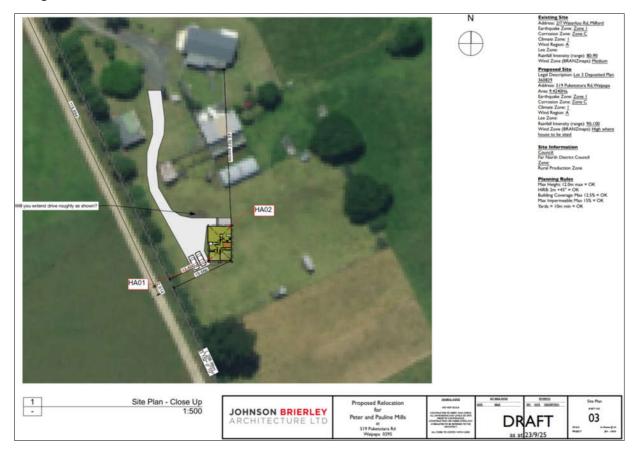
Draft architectural Site Plan depicting the proposed development (from the client).
